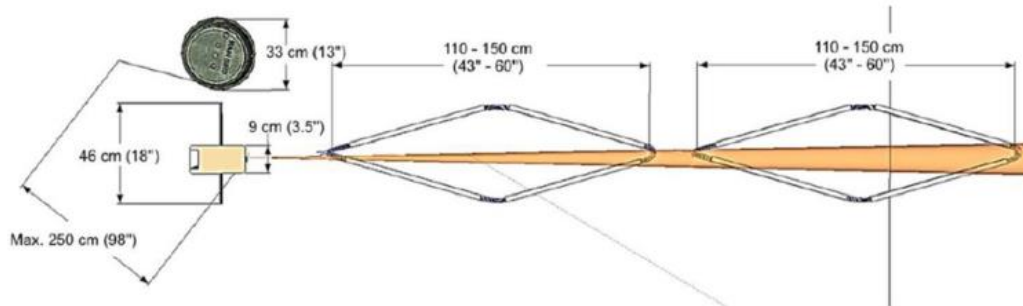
Manufacturer Installation Guide —Cross Section Detail
